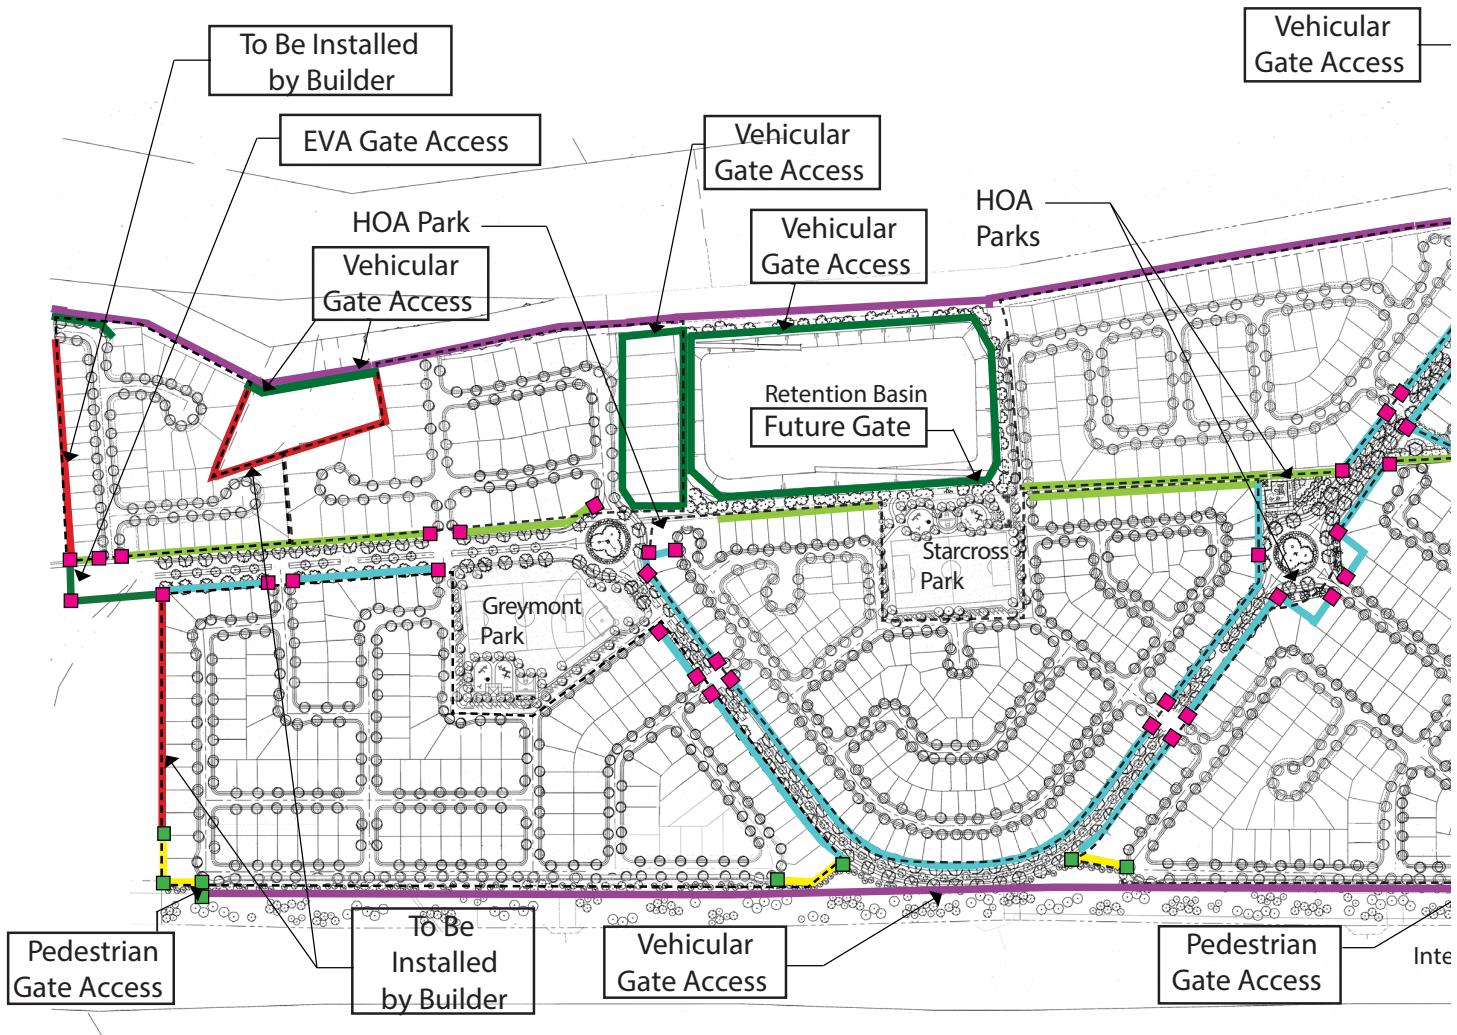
Master Wall and Fence Plan - Phase 1A
